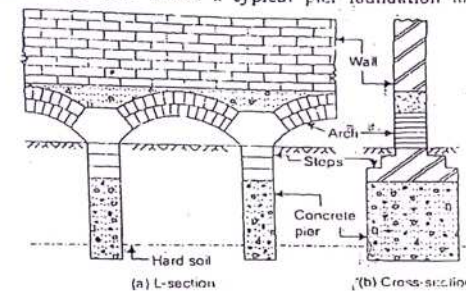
PIER FOUNDATIONS WITH ARCH.
